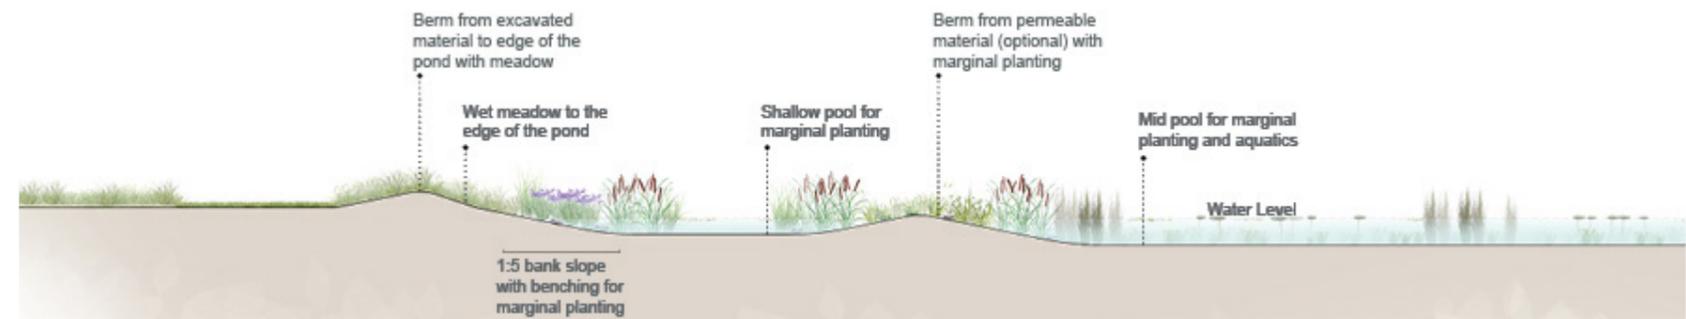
Typical cross section through attenuation pond, designed for wildlife #1
